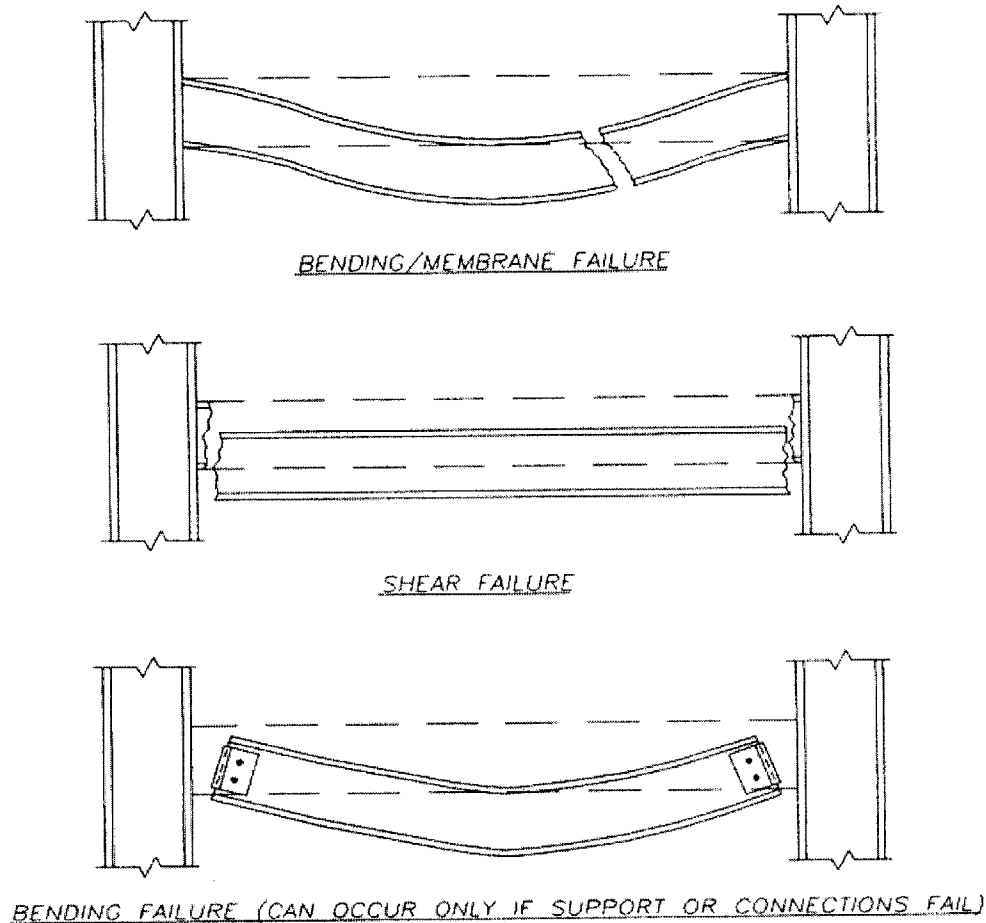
Failure due to insufficient ties and poor detailing of the joint. (11)
